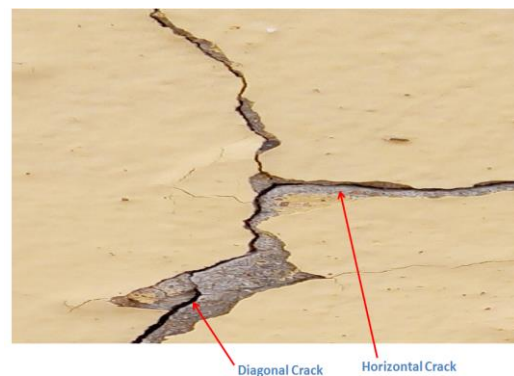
Diagonal and Horizontal Cracks on the Wall of a Laboratory in the University
